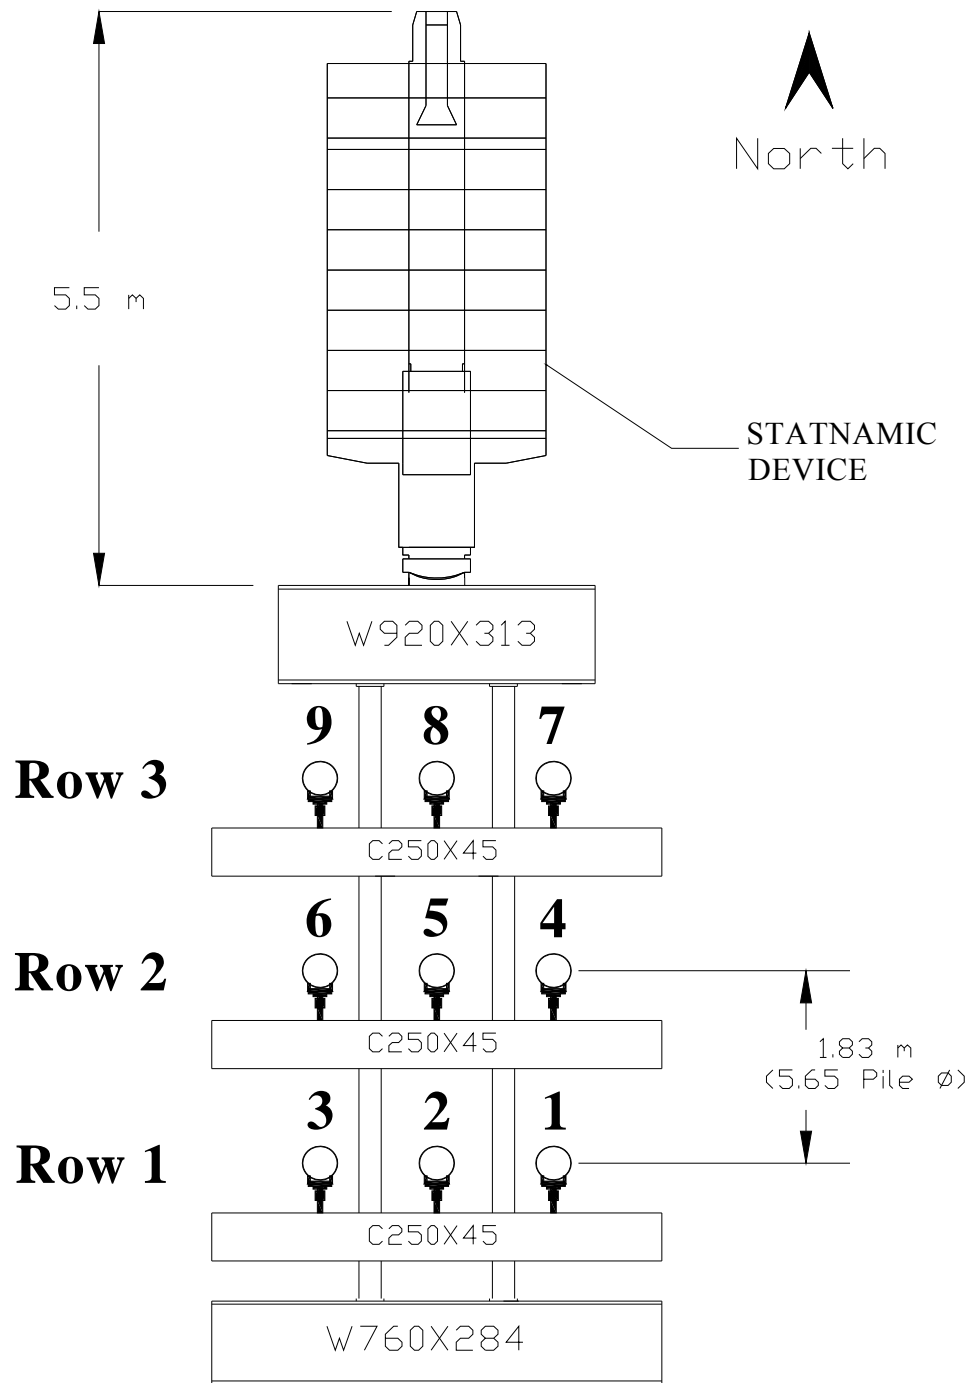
Plan view of 9-pile group layout with pile and row numbering.
